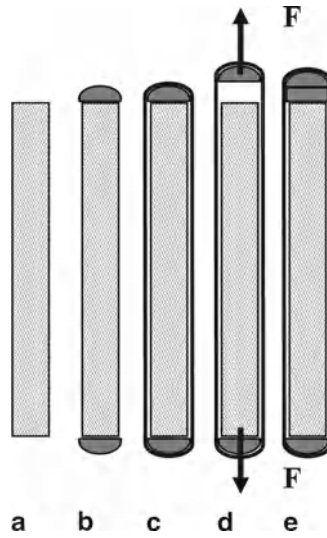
Conception for post-tensioning with CFRP straps shown on the example of a steel rebar reinforced concrete shear wall: (a) cross section of shear wall, (b) addition of semi-elliptical interface pad elements that are placed on the *bottom* and *top* faces of the shear wall, (c) the layers of the CFRP tapes are wound around the pads and shear wall, (d) the straps are tensioned by lifting the top interface pad using a jacking system, (e) the post-tensioning force is applied to the concrete by overstressing the straps, inserting spacers between the interface pad and the shear wall and then releasing the tensioning force
